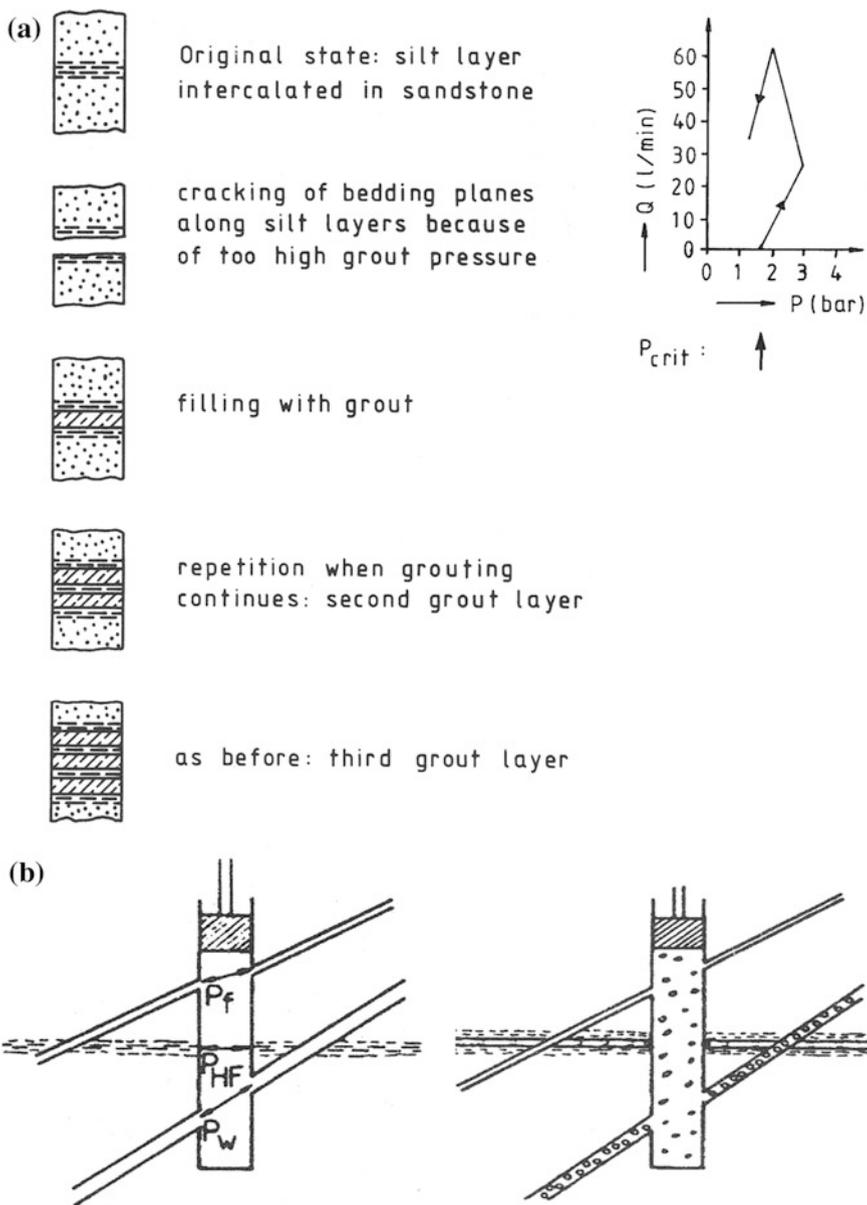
a Twist-dam horizontal bedding planes are fractured at low pressures and filled with grout. Further grouting phases yield repetition of fracturing along bedding planes subsequently also grouted. b Twist Dam: wide fissures are grouted at low pressures, fine fissures need high pressure but bedding planes are fractured and grouted before
